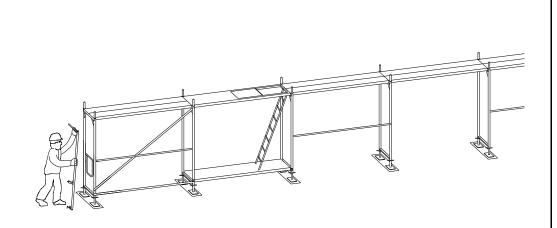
Preparing the guardrail post with advanced end guardrail
